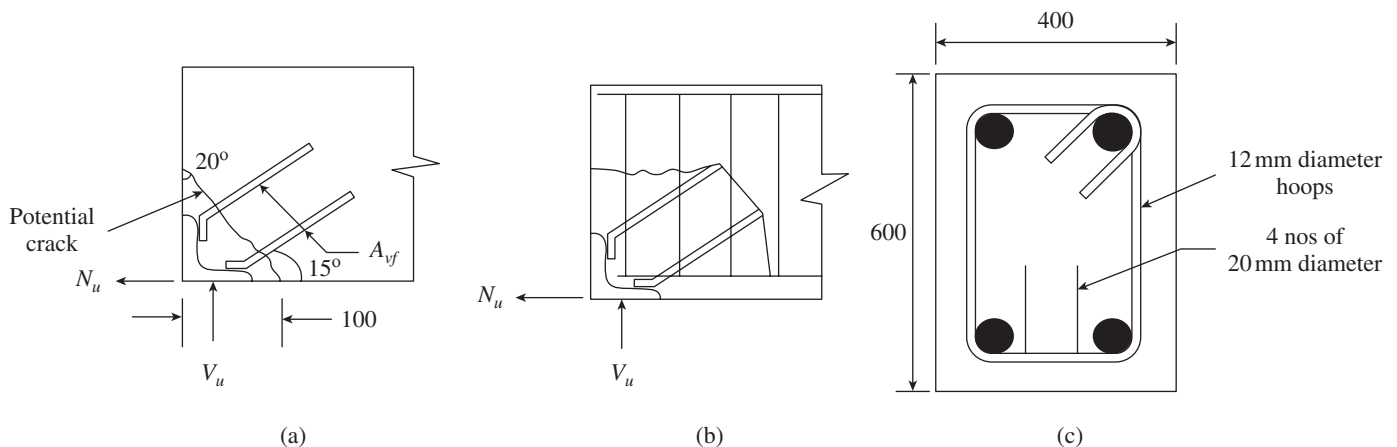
Precast beam of Example 6.8 (a) Detail at bearing with assumed crack (b) Second possible crack (c) Shear reinforcement
